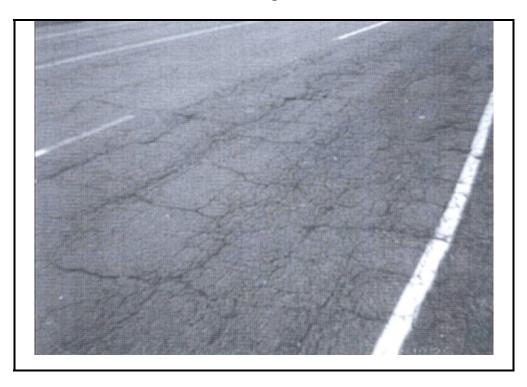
Block and Transverse Cracking in Flexible Pavement, High Severity
